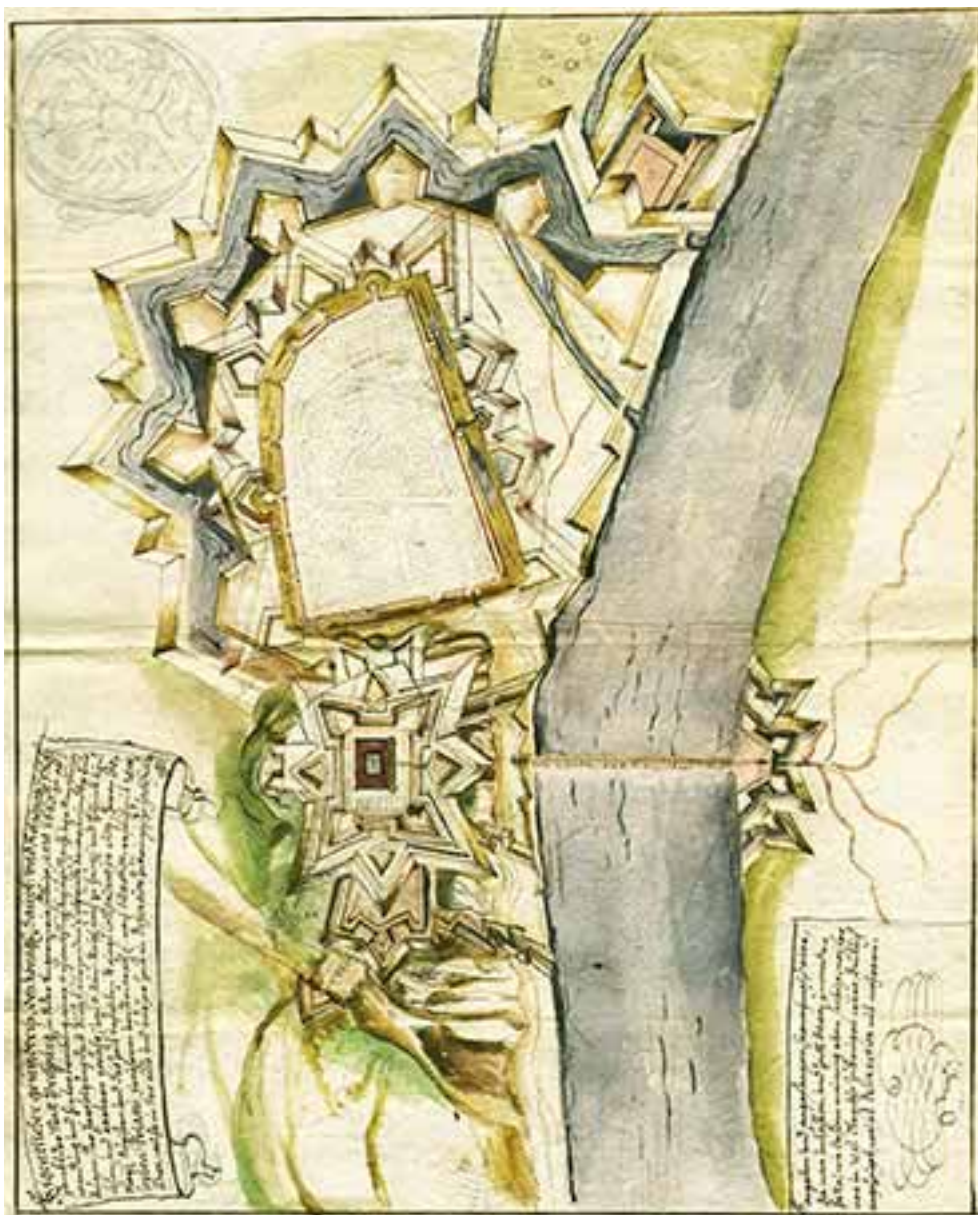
Priami's general plan to fortify the castle and the town of Pozsony
